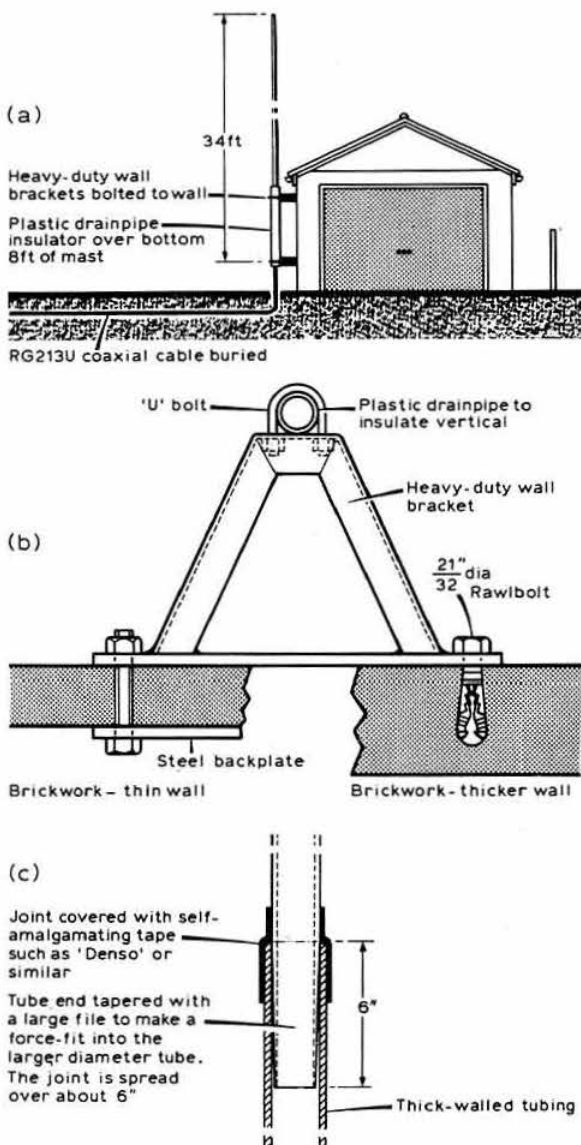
(a) Construction. (b) Mounting details showing either Rawlbolt or backplate. (c) Jointing detail—aluminium tubes
